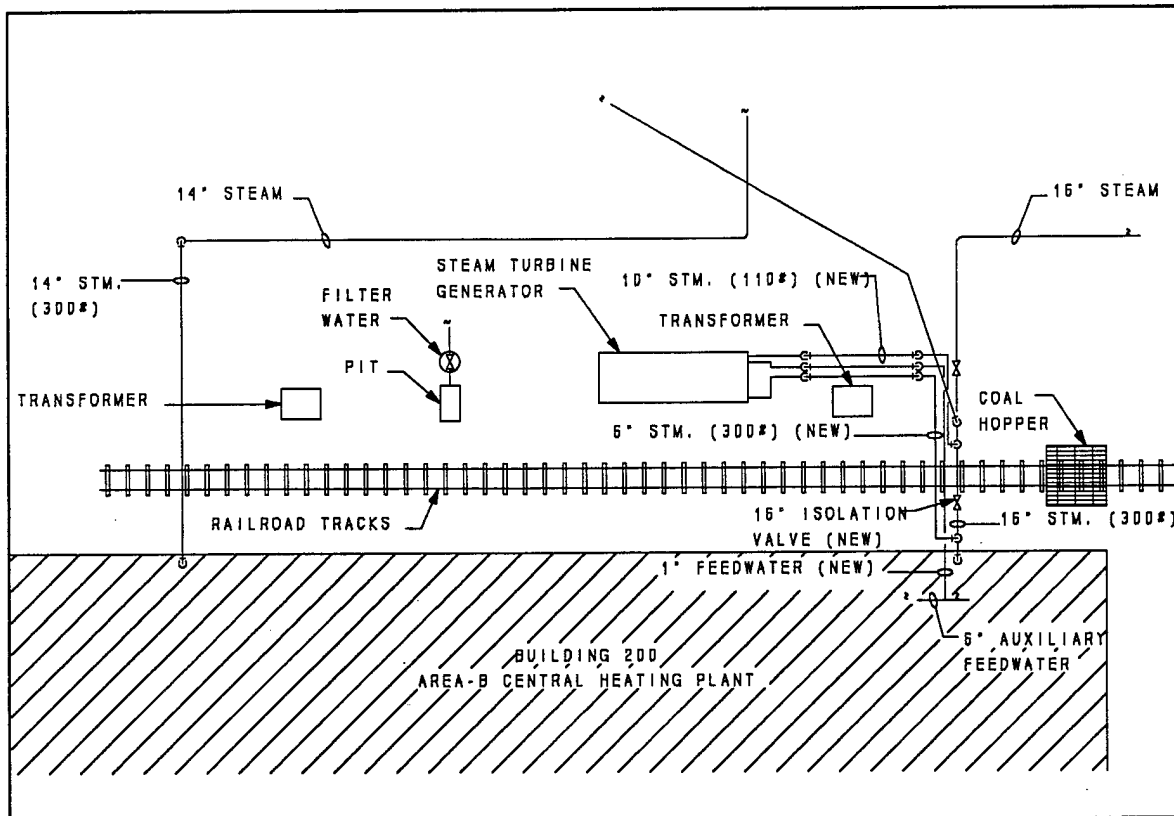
STEAM TURBINE-GENERATOR PLANT SITE
